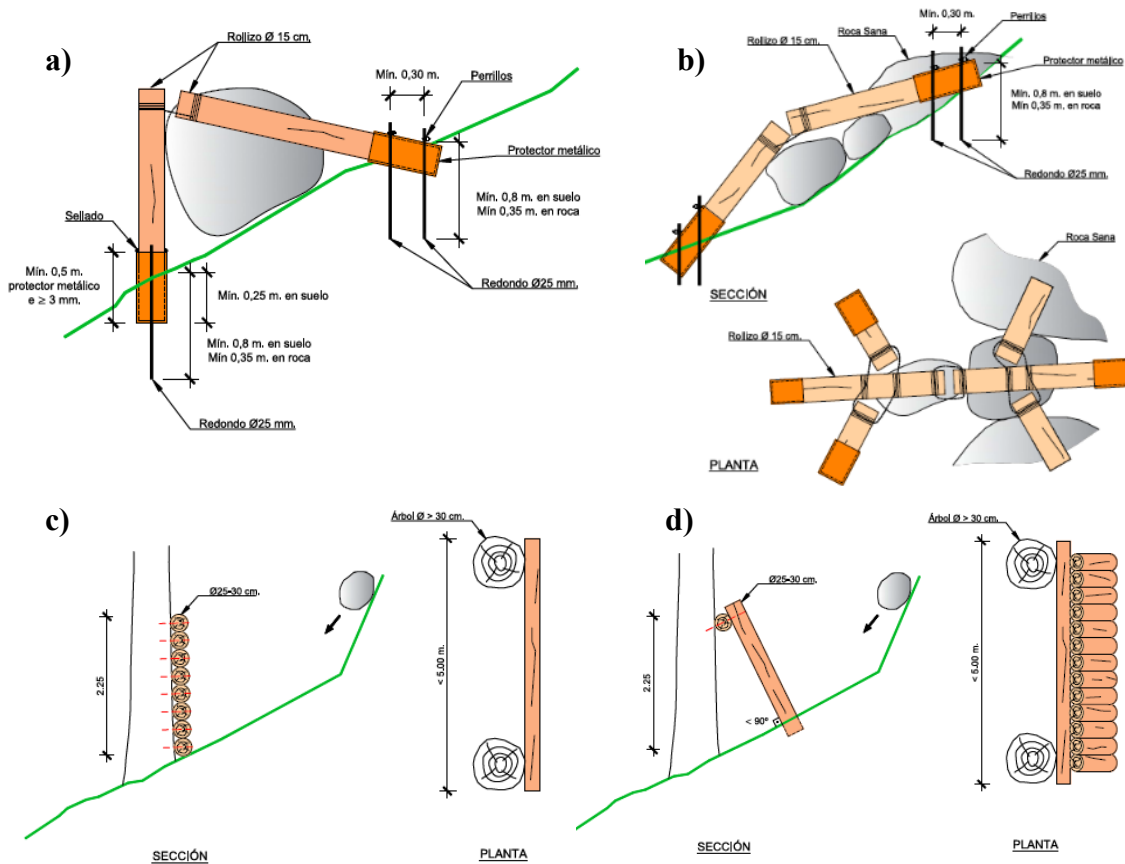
Examples of designed NBS consisting of in (top) rock fixing structures and (bottom) passive rockfall barriers. a) wooden tripods fixing individual boulders; b) wooden meshes fixing grouped boulders; c) rockfall wooden barriers with a horizontal pattern; d) rockfall wooden barriers with a vertical pattern.
